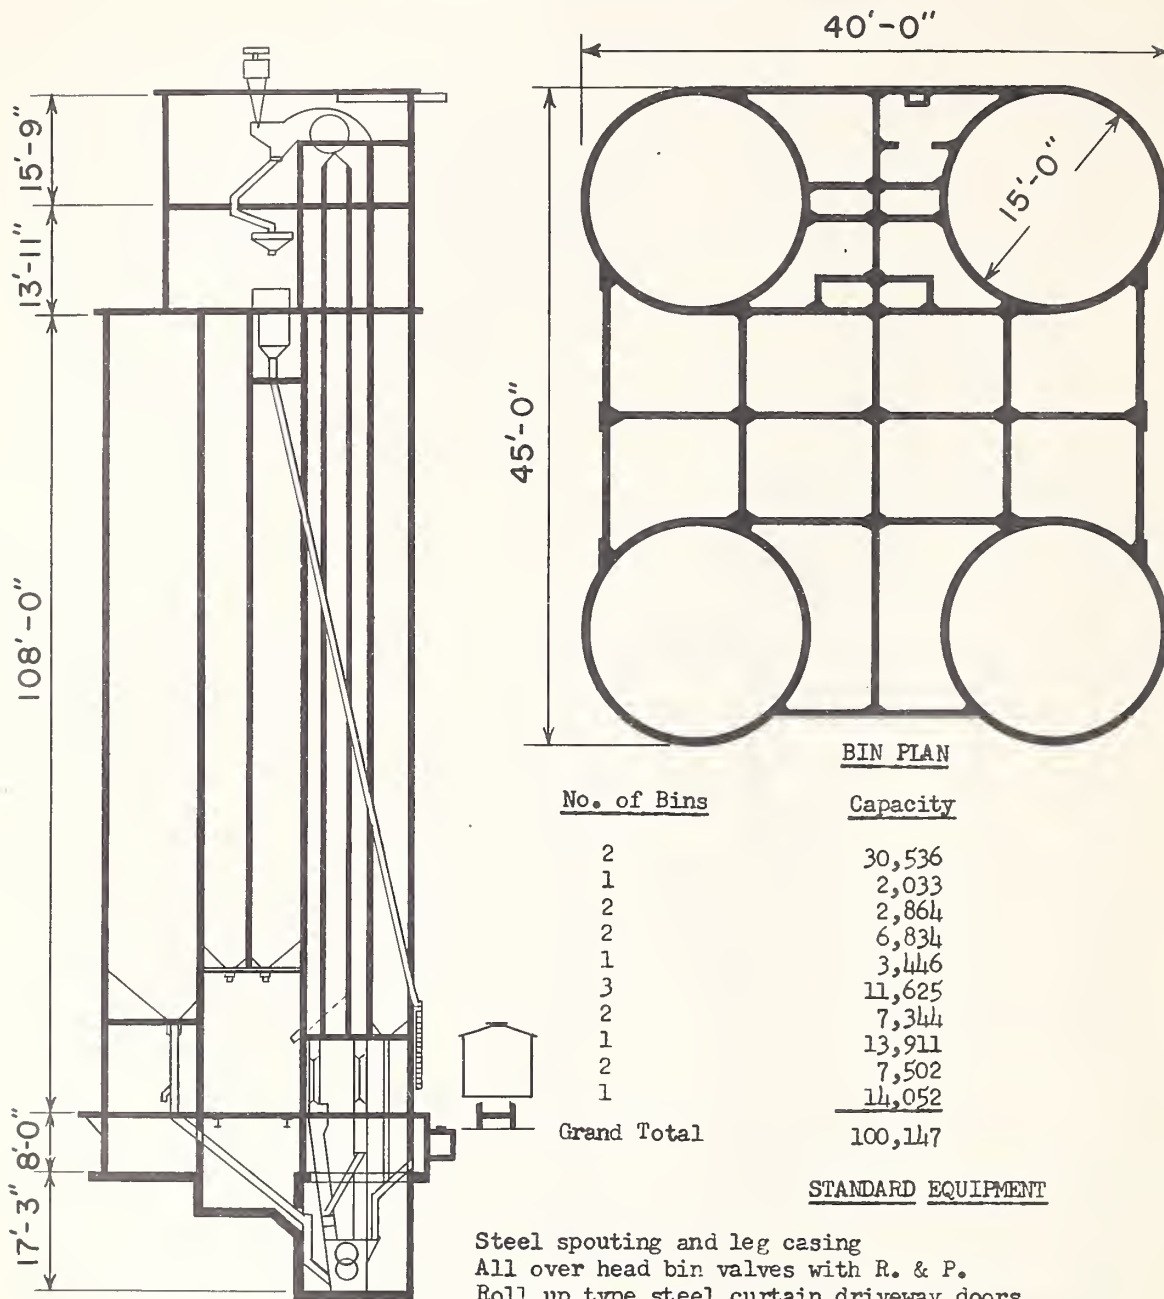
TYPE OF NEW ELEVATOR DESIGN AND EQUIPMENT INSTALLATION
